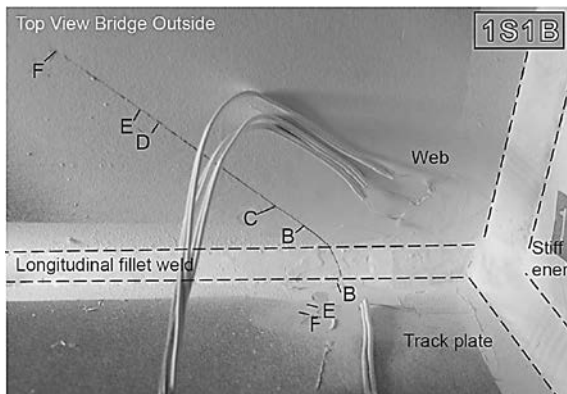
Crack arising at outer side longitudinal weld of trough tests.
